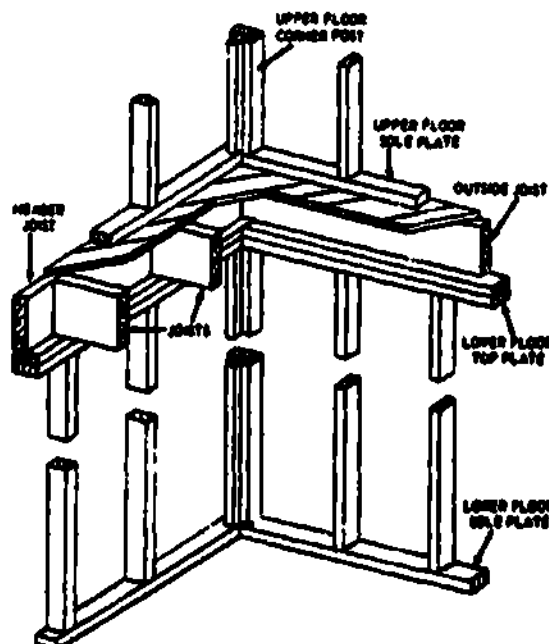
Method of framing upper-floor joists and studs in platform framing.
